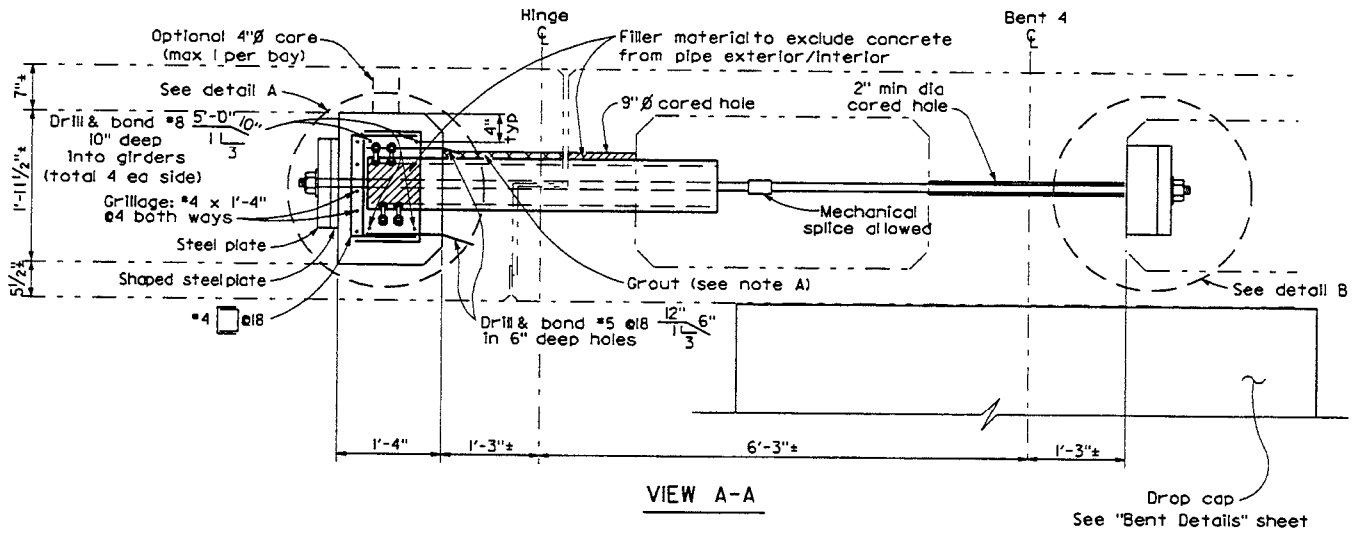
Concrete Box Girder Pipe Seat Extenders with Restrainer Rods.
